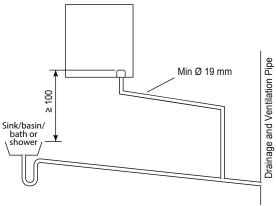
Connection of Condensate Water Drainage Pipe at Indoor Bathroom Drainage Lower Level
